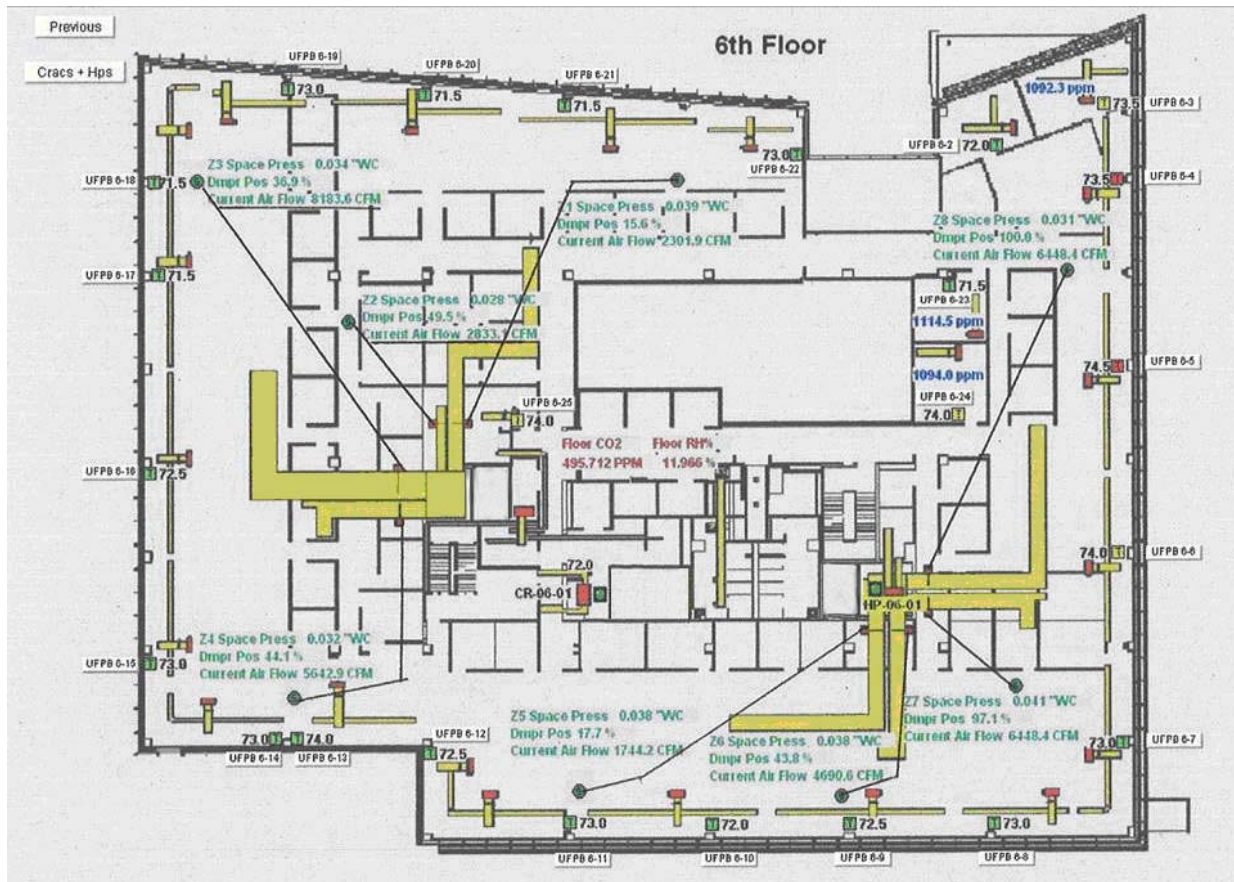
Schematic 6th floor plan taken from building automation system screenshot
